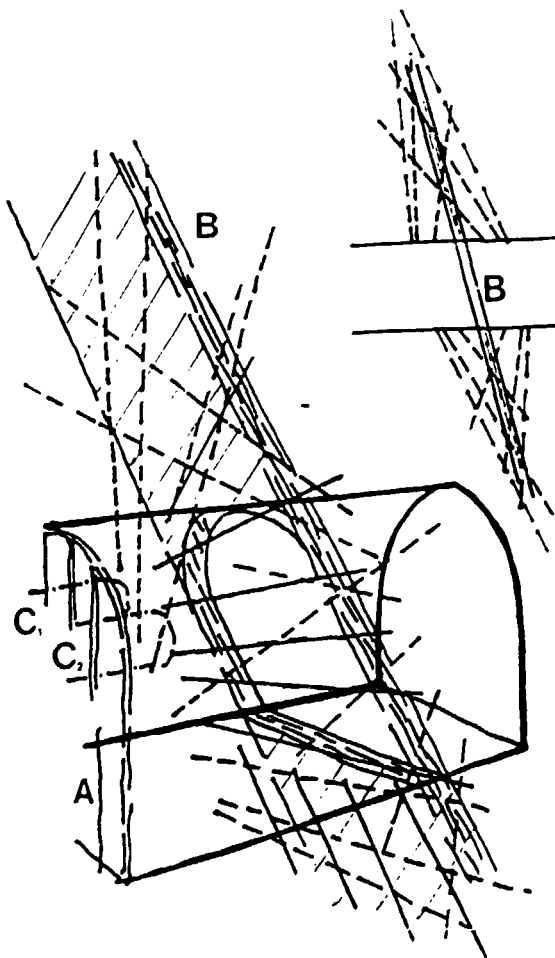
Schematic picture of the arrangement for grouting of the natural fracture zone in 3D
